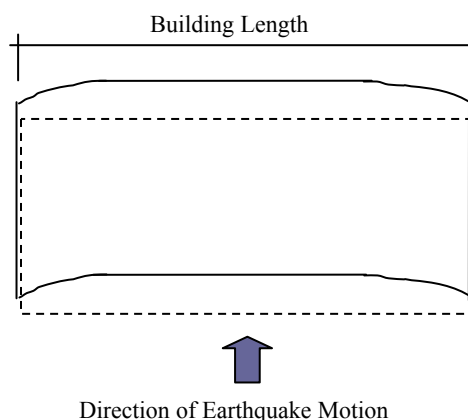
Inelastic deformation of steel roof diaphragms in typical single-storey structures during a severe earthquake.
